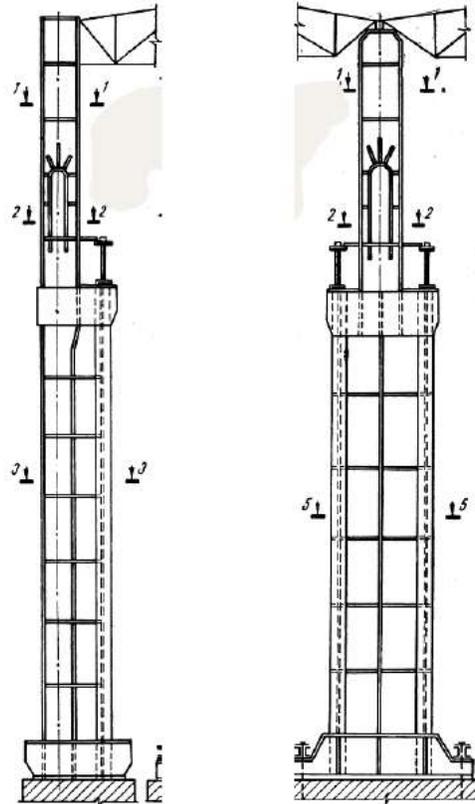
Examples of plated elements (columns) at heavy industrial buildings
